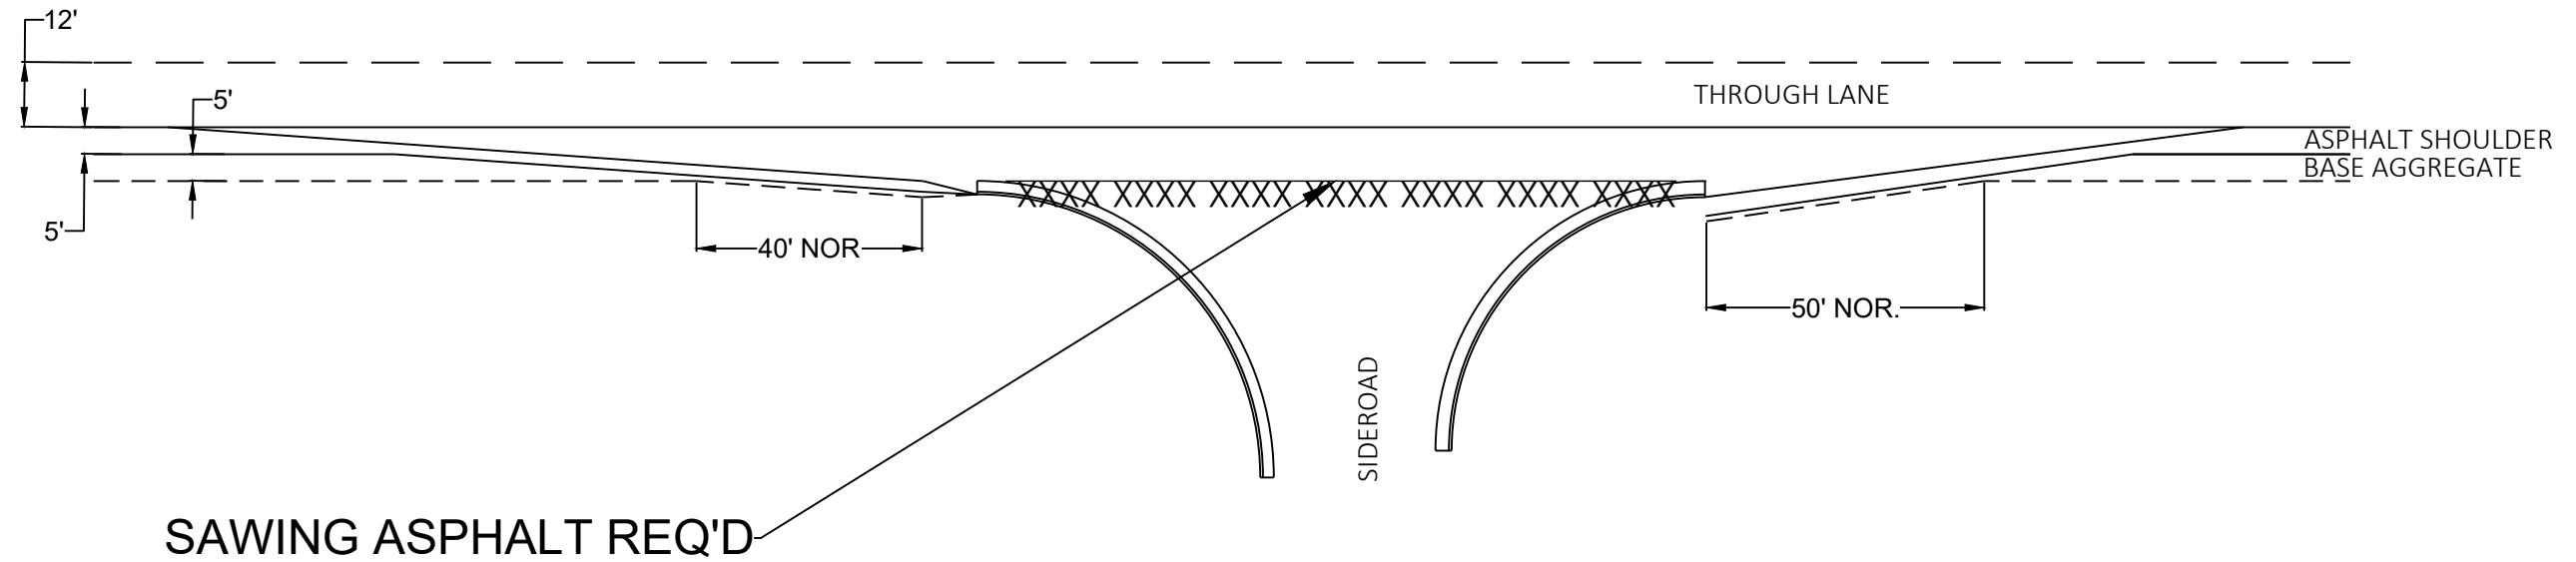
DETAIL FOR ASPHALTIC SHOULDER AT BEAM GUARD
